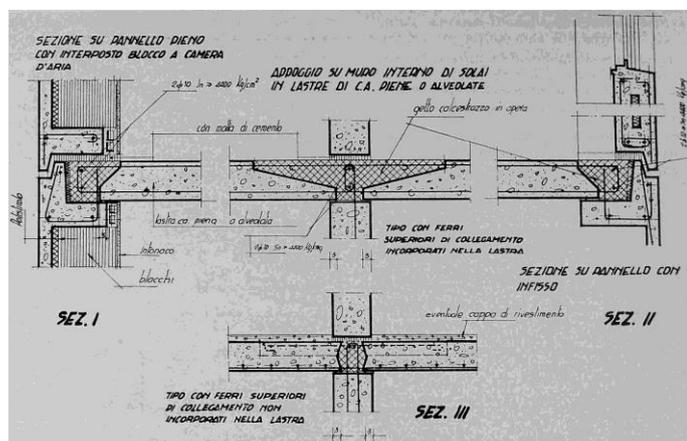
Baretts system. Sections on the horizontal connection joints / Sistema Baretts. Sezioni sui giunti orizzontali di connessione (Borini 1966).
